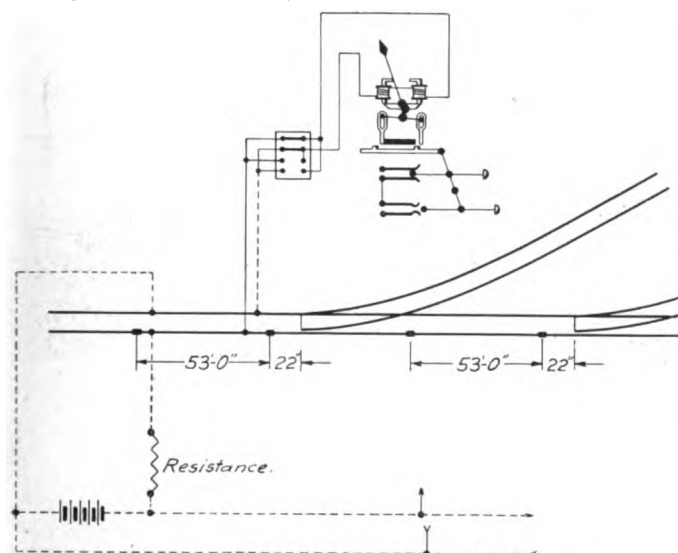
Arrangement of Insulated Joints at Switches Controlled by Push Button Machine.
